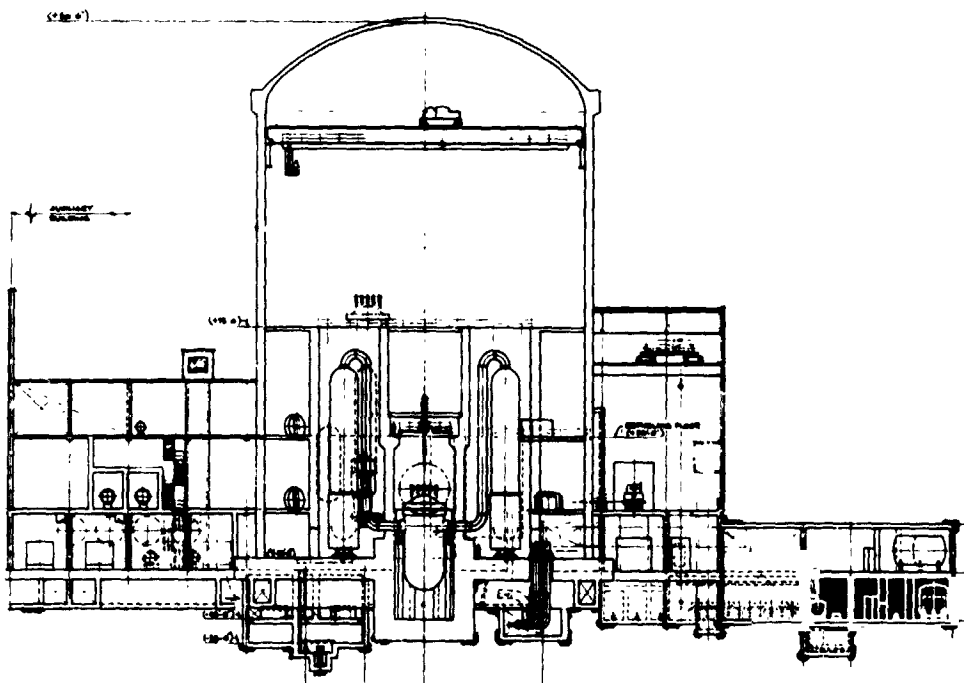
Section of typical pressurized water nuclear power plant structure.
